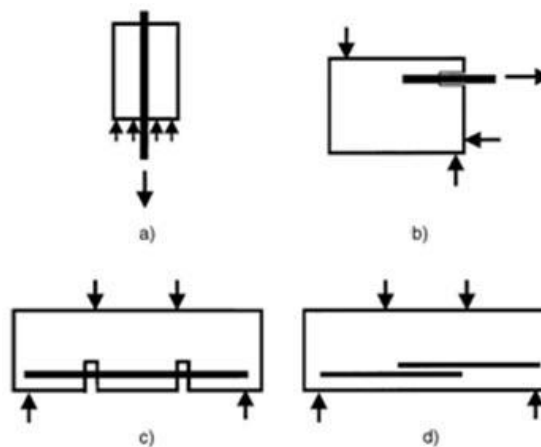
Schematic of: a) pullout specimen; b) beam-end specimen; c) beam anchorage specimen; and d) splice specimen (ACI committee 408, 2003)
